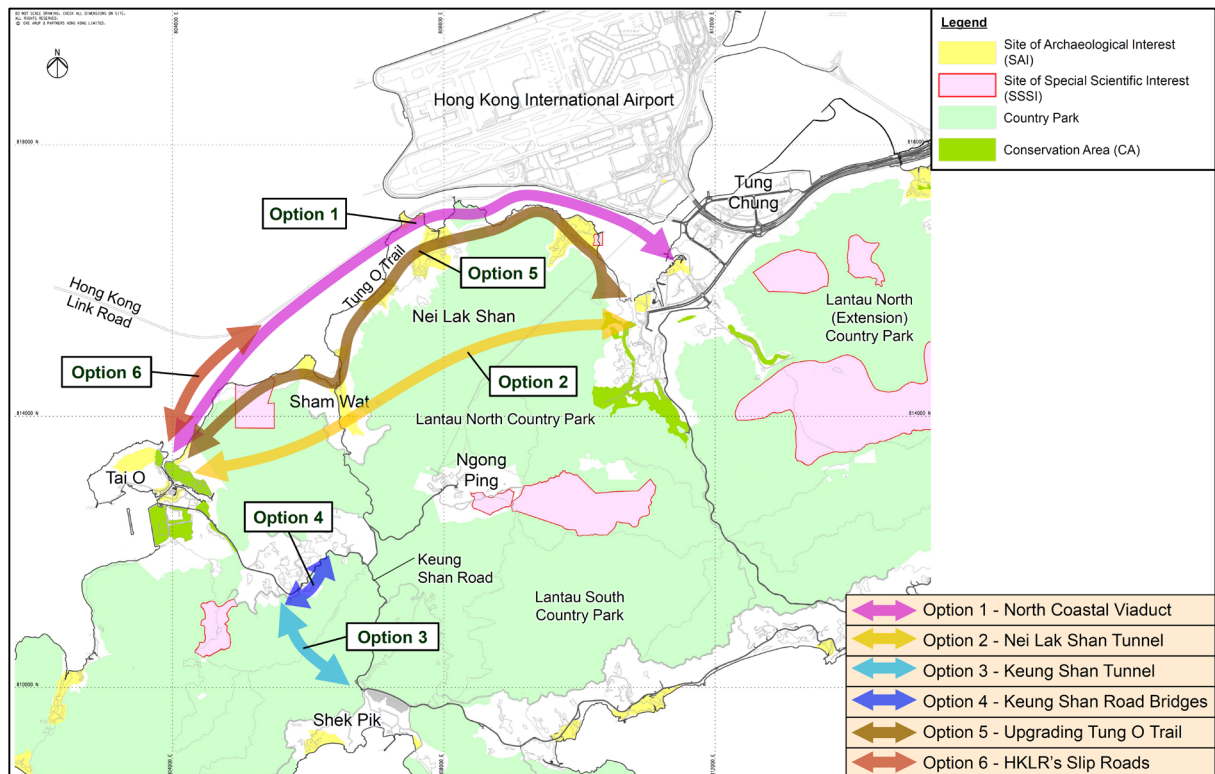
Schematic Layout of Possible Road Connection Options between Tung Chung and Tai O
